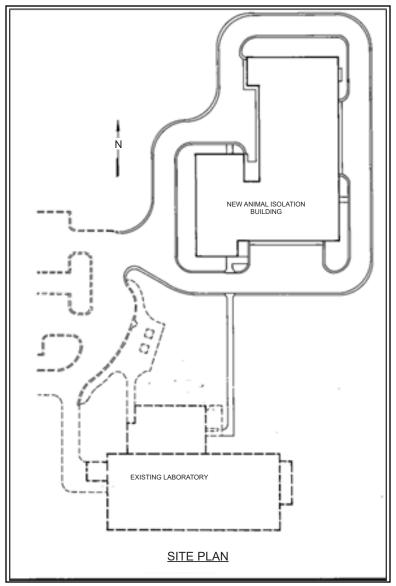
Architectural Drawing of NWHC Site Plan for Construction of the TIB, 1984 (USFWS 1984)
